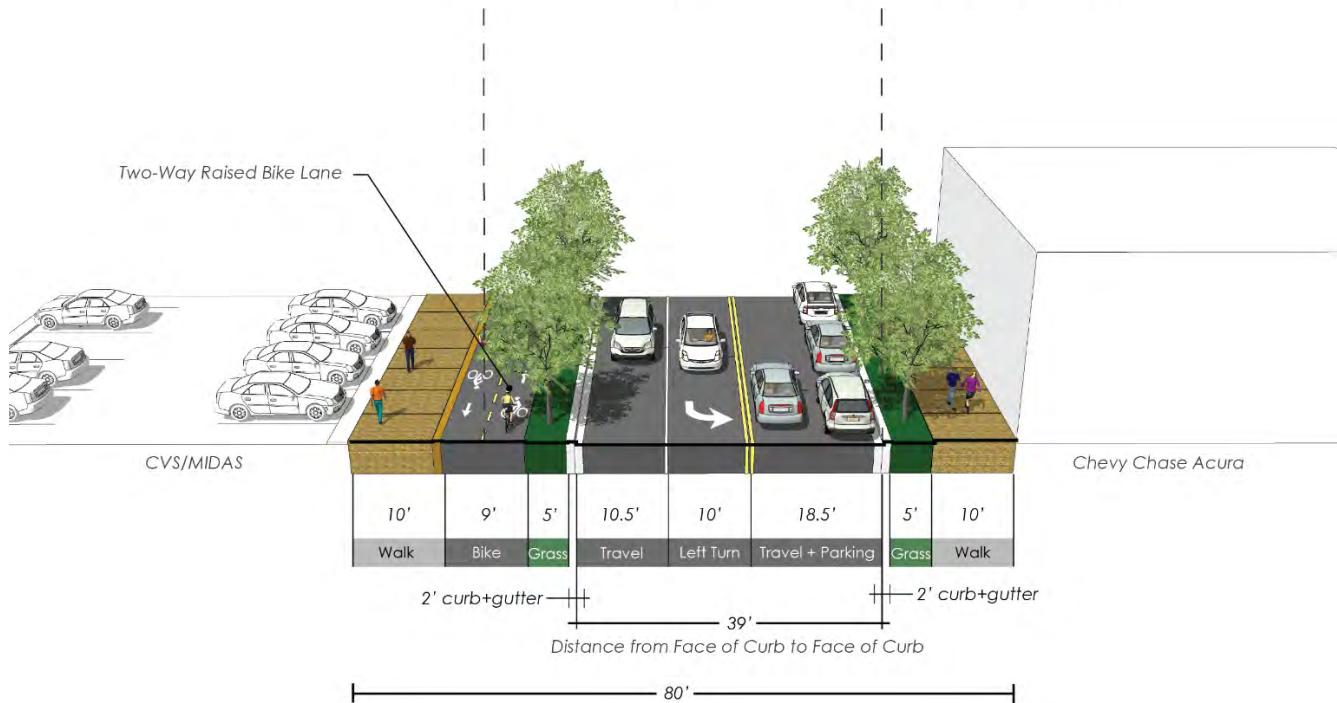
Bikeway Facility Type Option 5 - Two-way Raised Separated Bike Lanes
